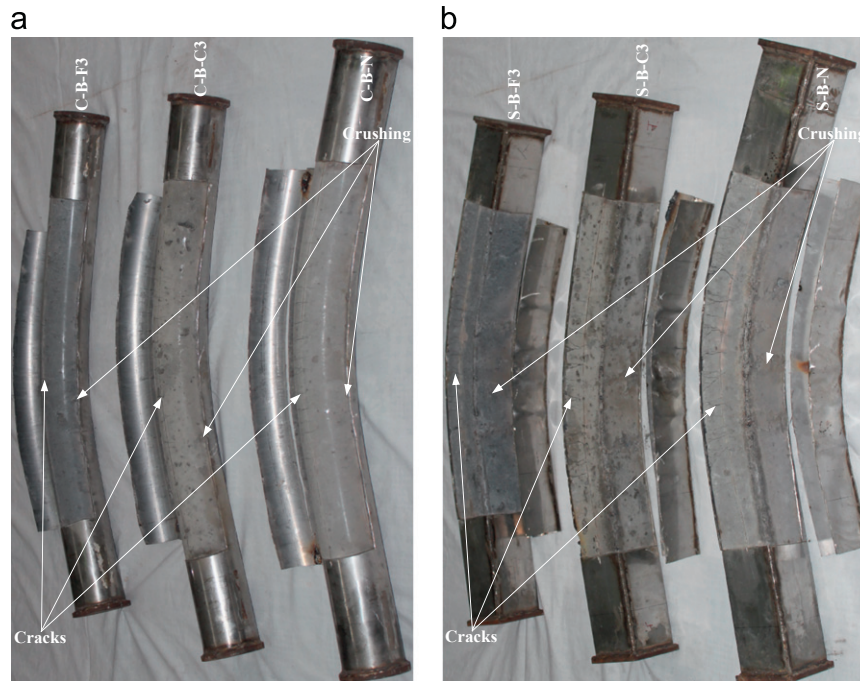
Typical failure pattern of core concrete in beams. (a) Circular section. (b) Square section.
